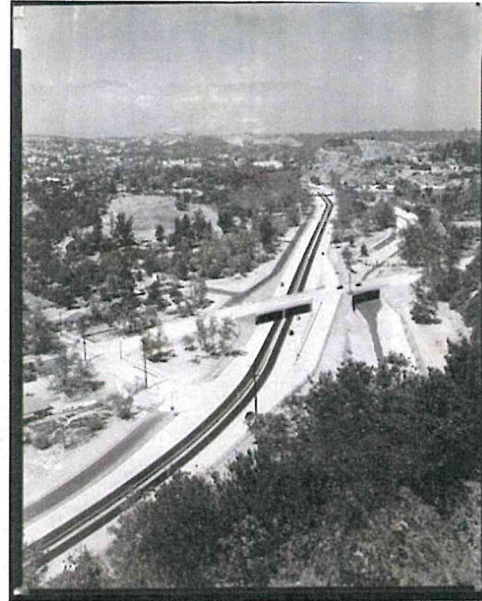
Newly opened section of the Arroyo Seco Parkway between Los Angeles and Pasadena, July 1940. Source: Pasadena Digital History Collaboration
